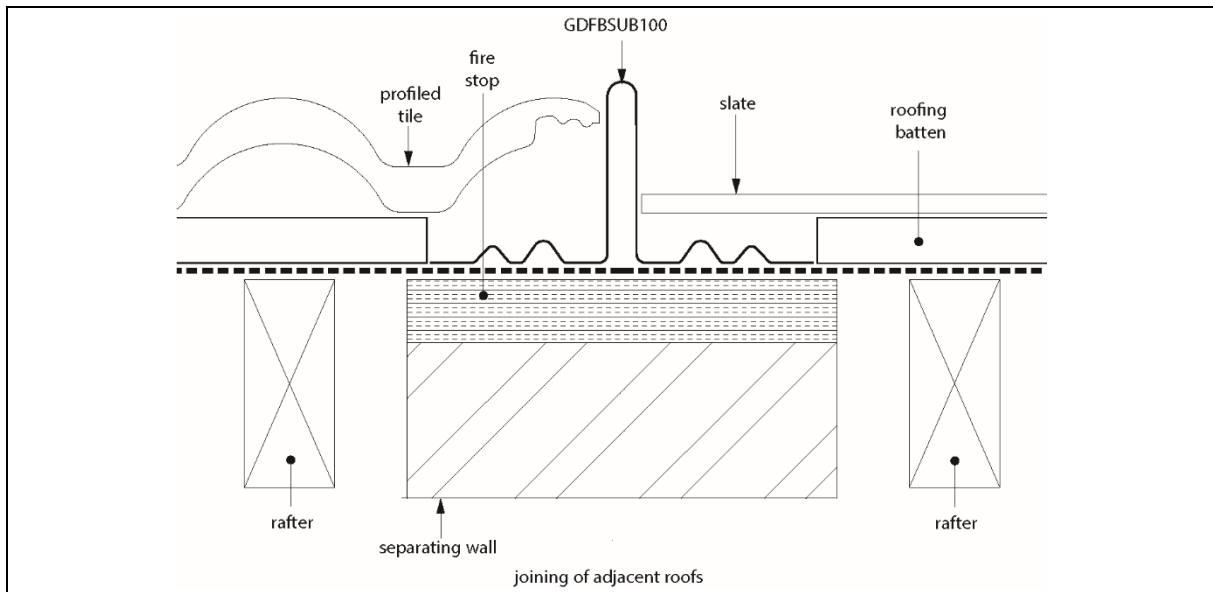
Filon GRP Dry Fix Bonding Strip – GDFBSUB 100 ((for adjoining profiled tile/slate roof applications)
